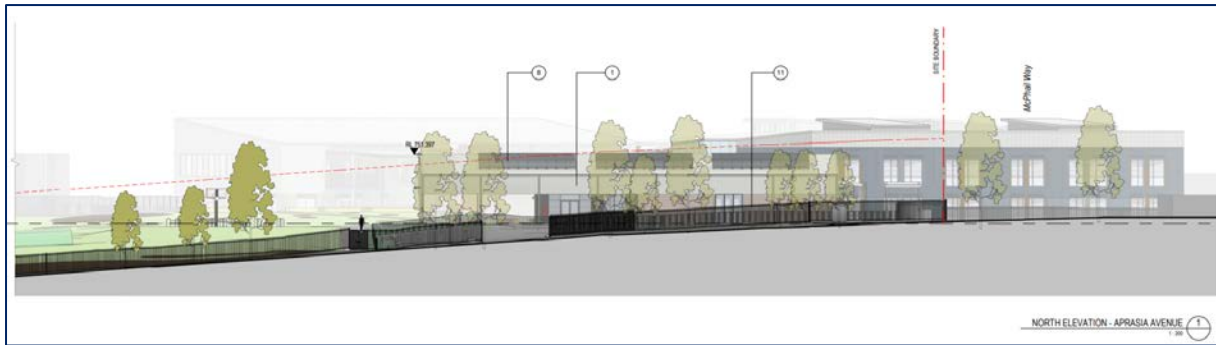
| Northern elevation (Aprasia Avenue) (Source: Applicant's RtS 2021)
